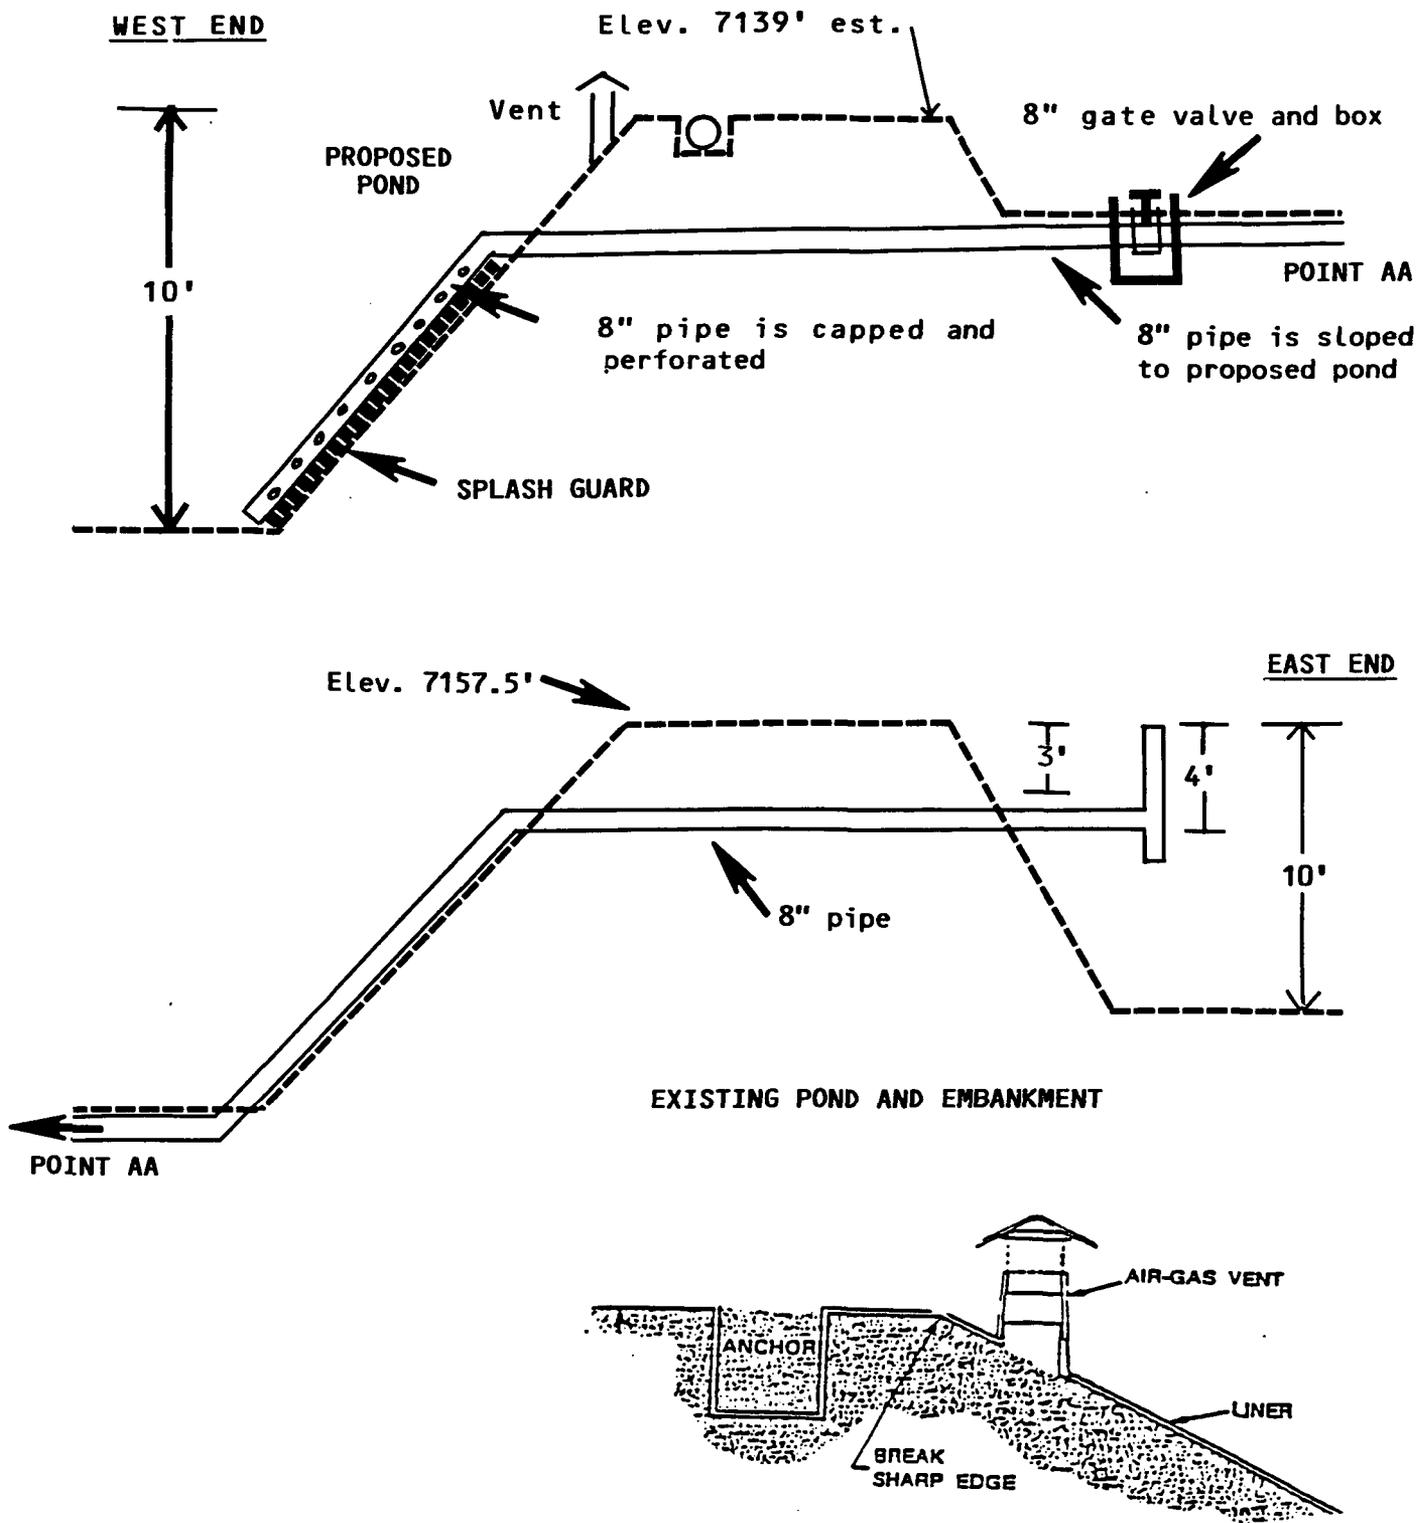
Cross-section showing the proposed placement of a siphon (in-take) pipes, gate valve, splash guard, and perforated discharge pipe in the transfer of water from the existing pond to the east to the proposed expansion pond through an eight inch (8") transfer pipe.
